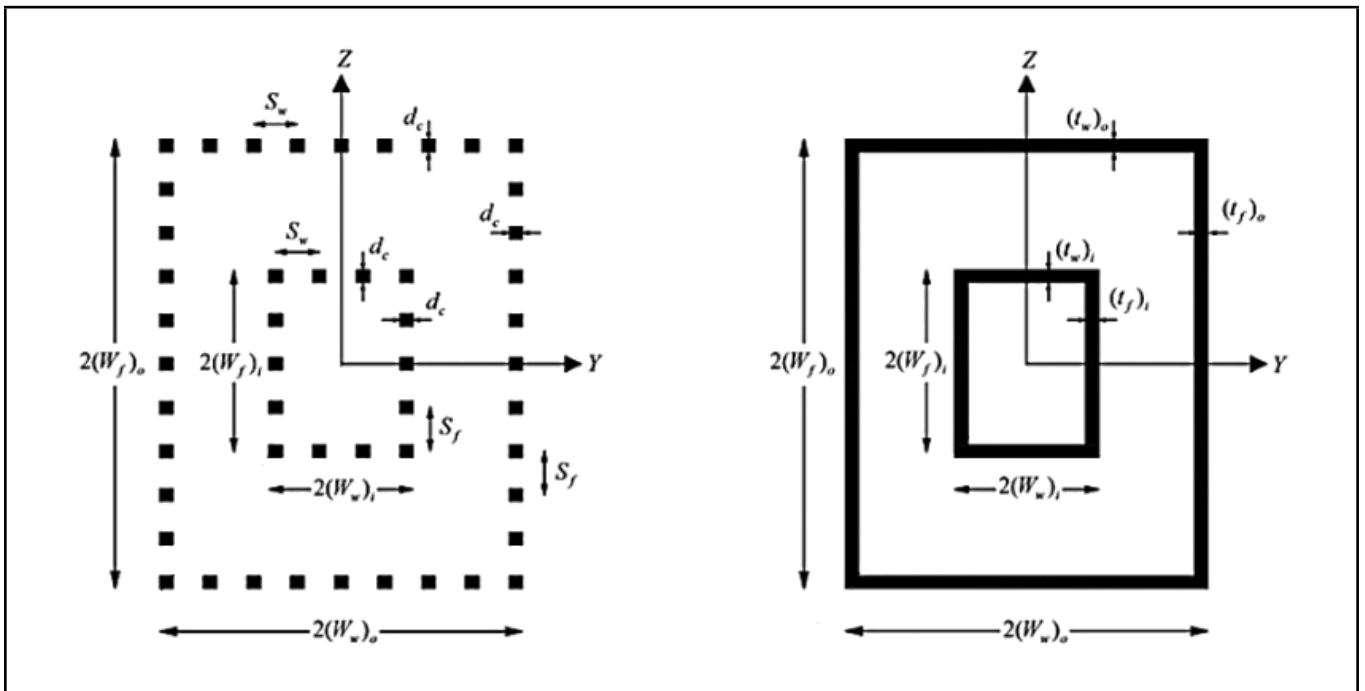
Plan of stepped tube-in-tube structural system with equivalent beam plan.
